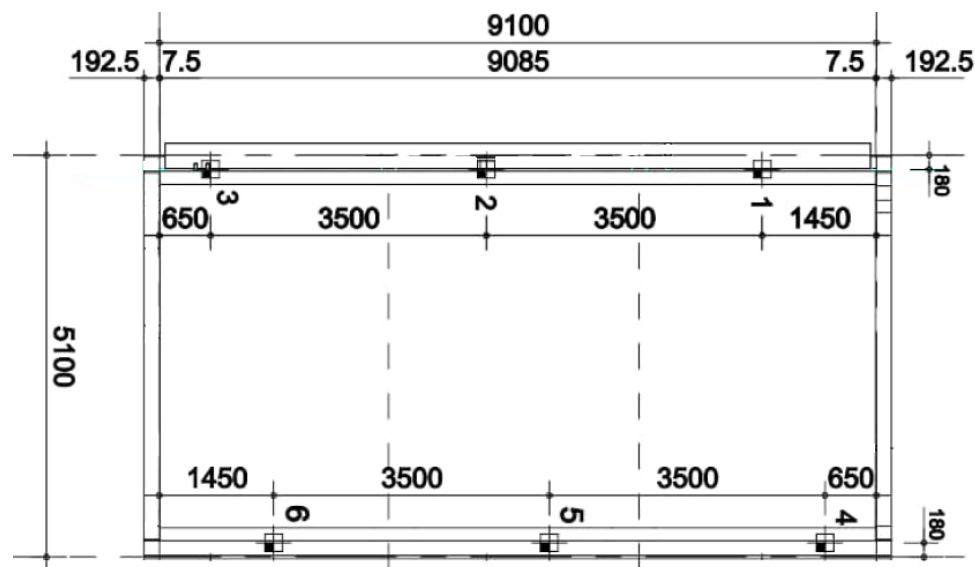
Foundation plan of six prestressed concrete foundation piles
